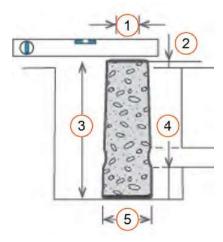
Indicative drawing for Satellite concrete foundation (standard installation flange)
